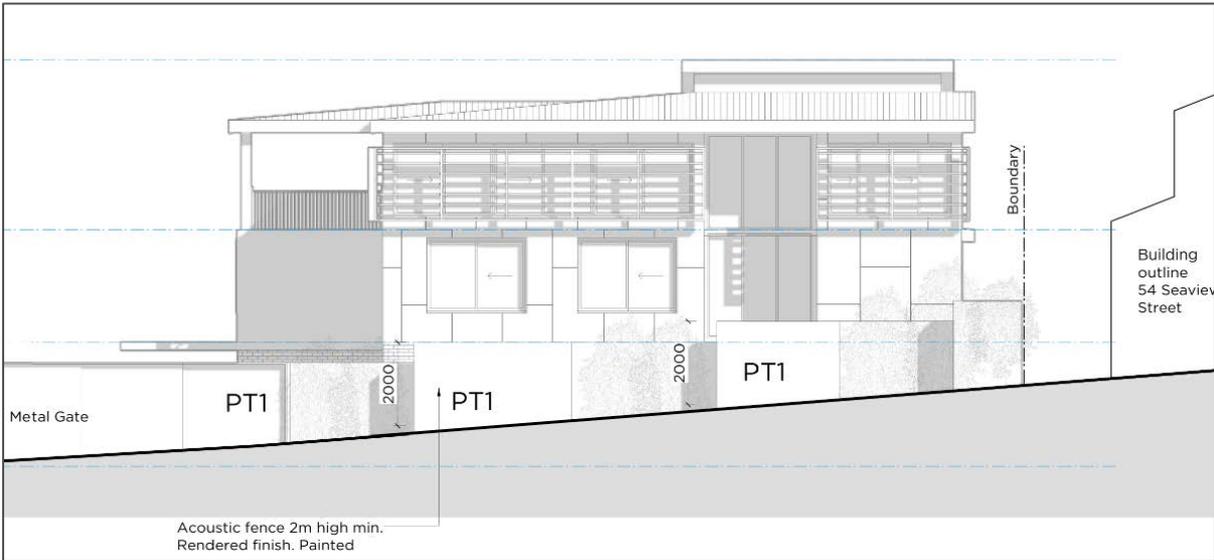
| Proposed Maintenance Building with the 2m high acoustic fence as viewed from Seaview Street (Source: Applicant’s SRtS 2021)
